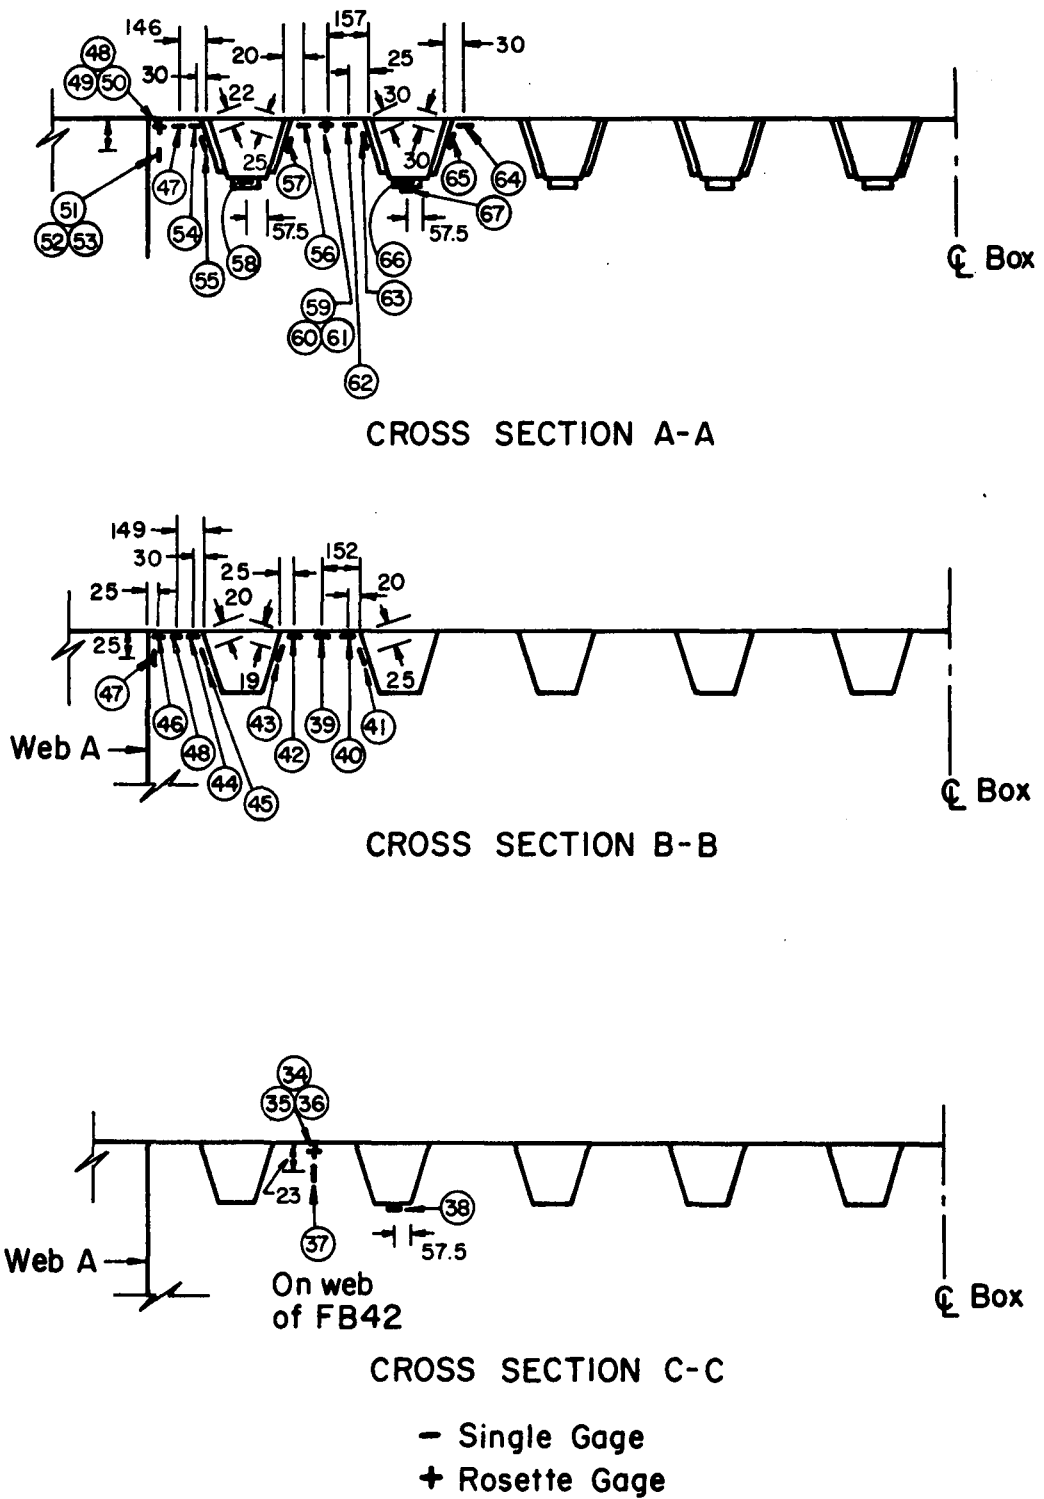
Location of Strain Gages on Cross Sections Near Floorbeam 42
